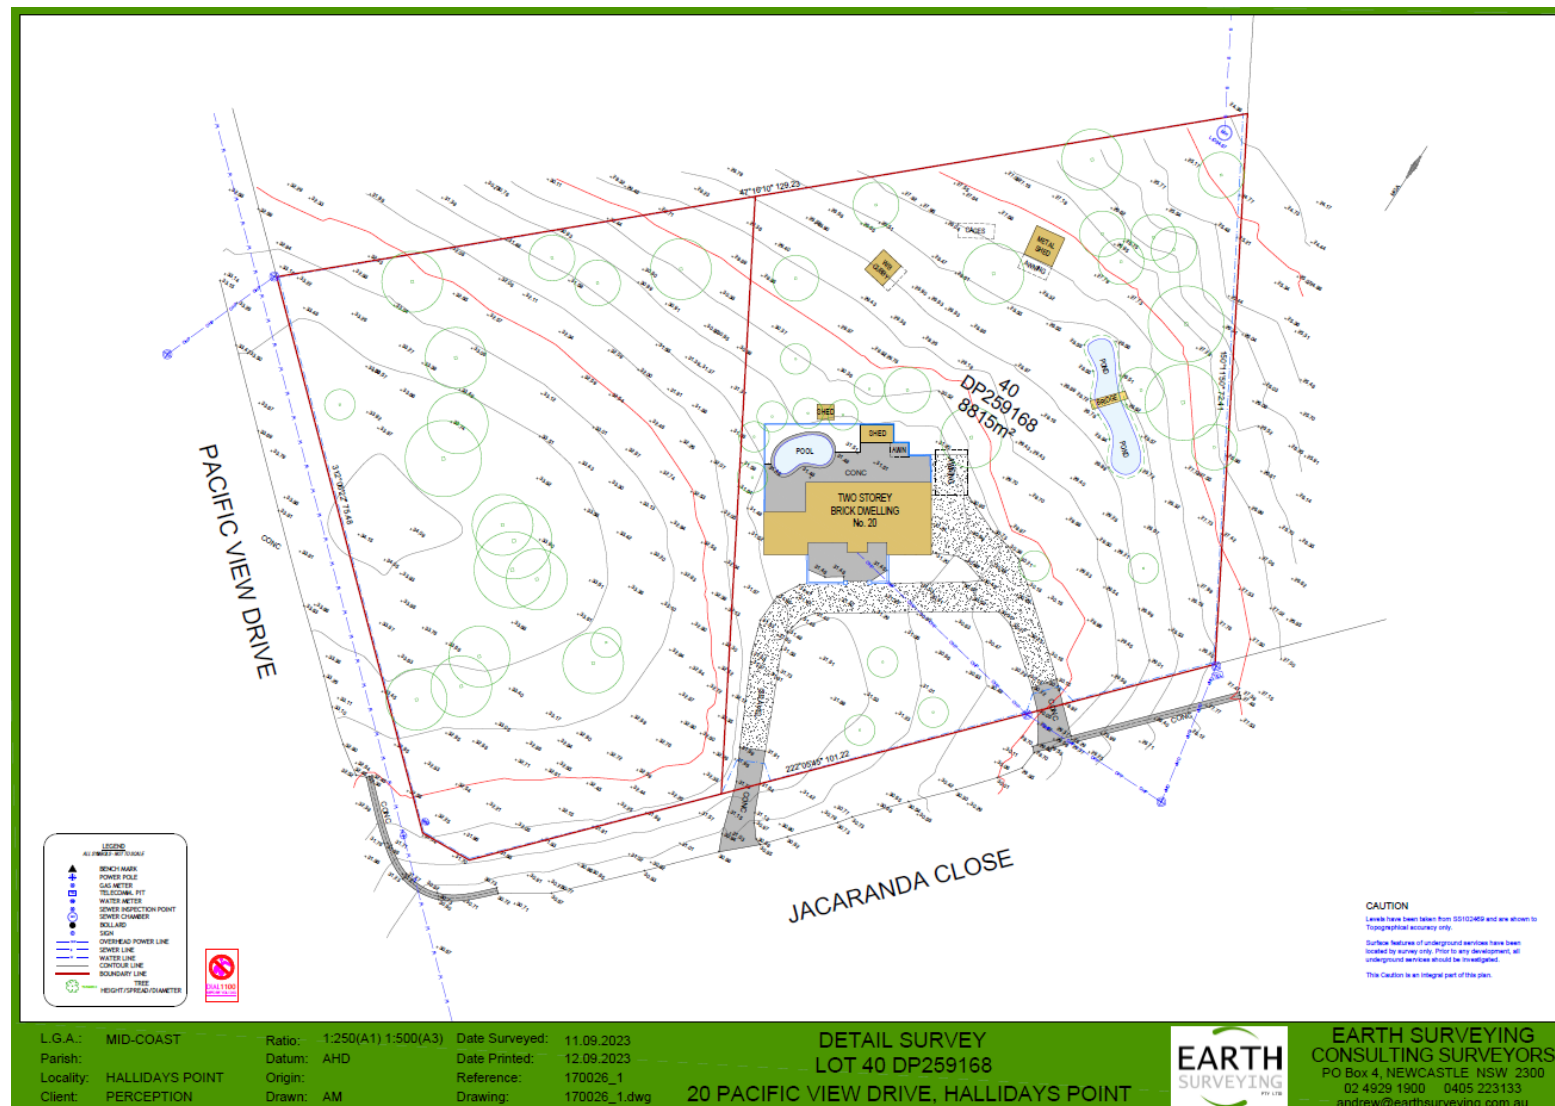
Proposed Subdivision Plan (Earth Surveying 2023)
